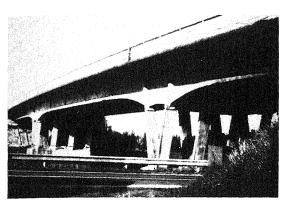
Bridge over Nete-canal at Lier (Belgium)
